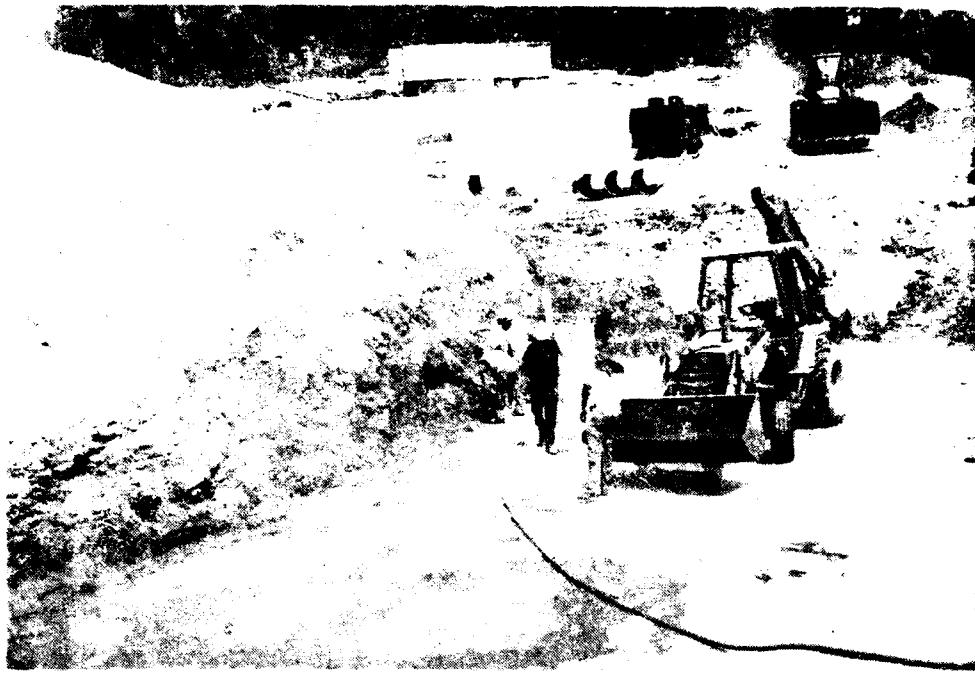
"Bathtub" treatment - setting coarse sand filter after concrete placement.
